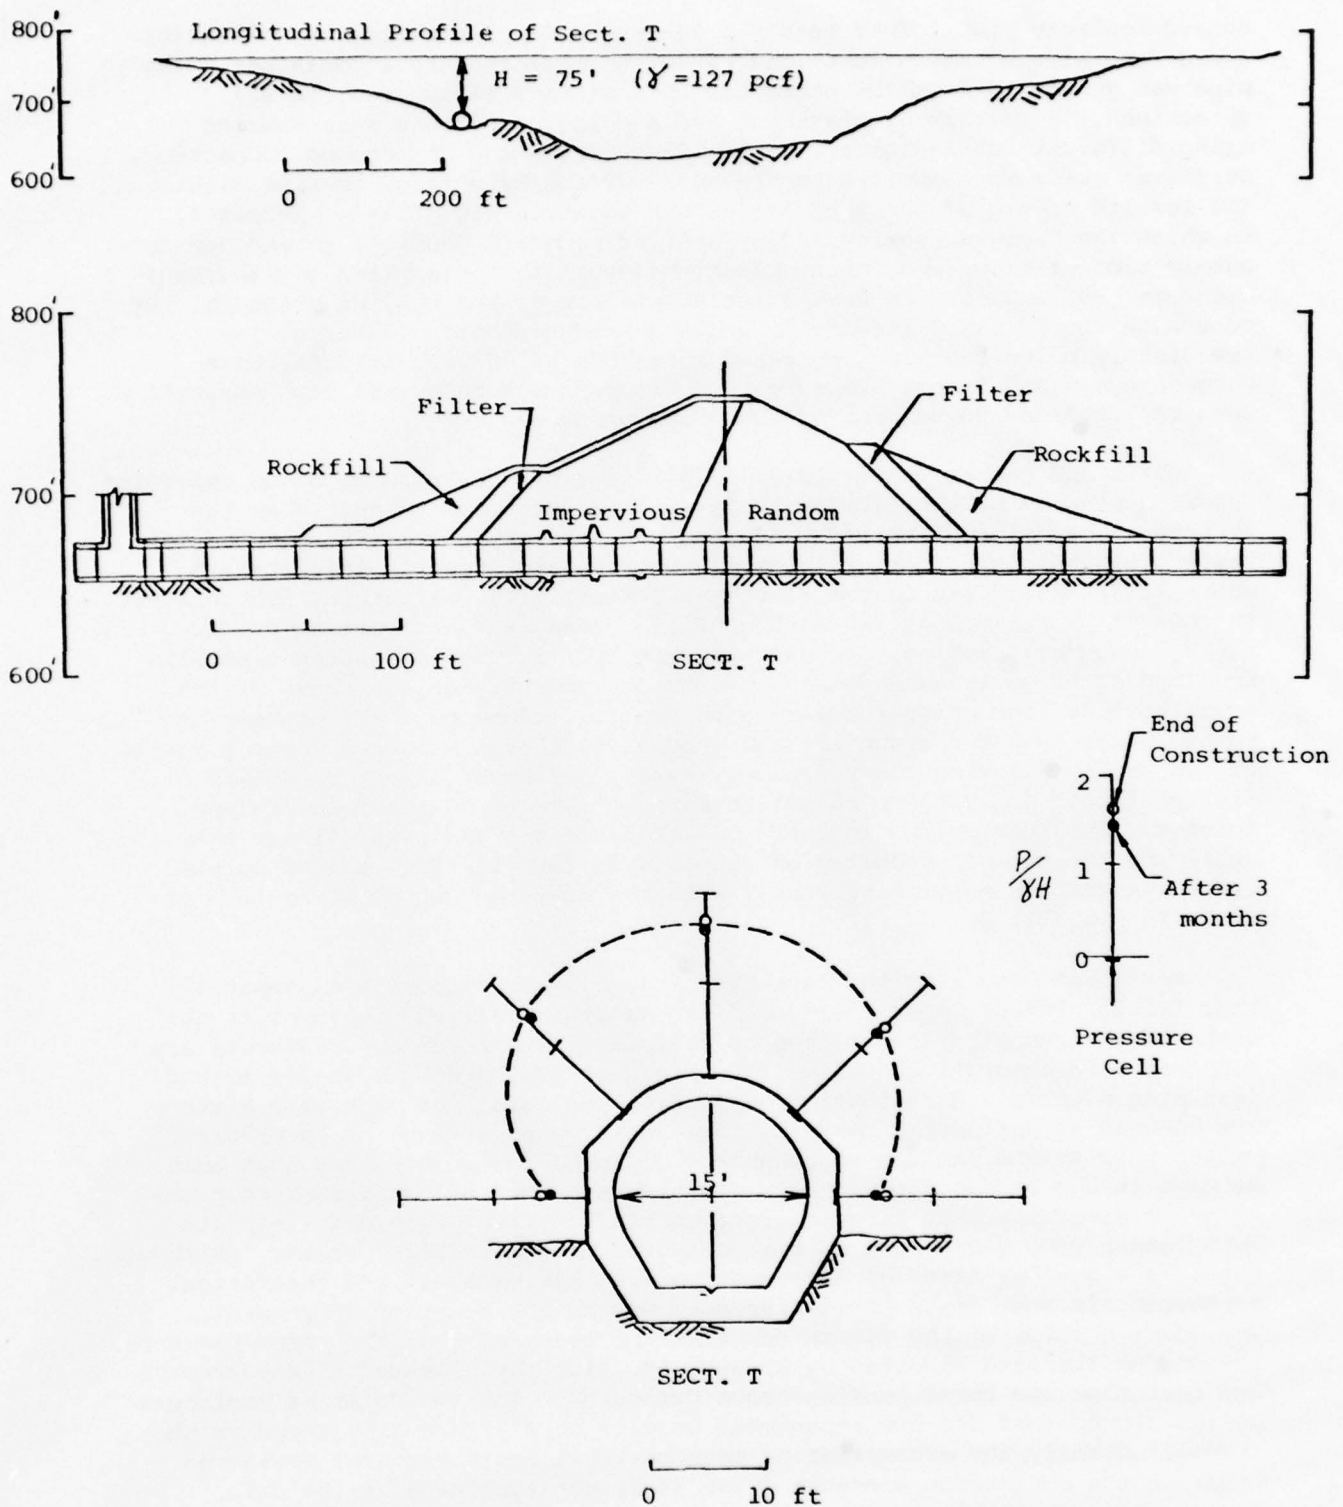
PRESSURE DISTRIBUTION ON 15-FT. I.D. CONCRETE CONDUIT,
